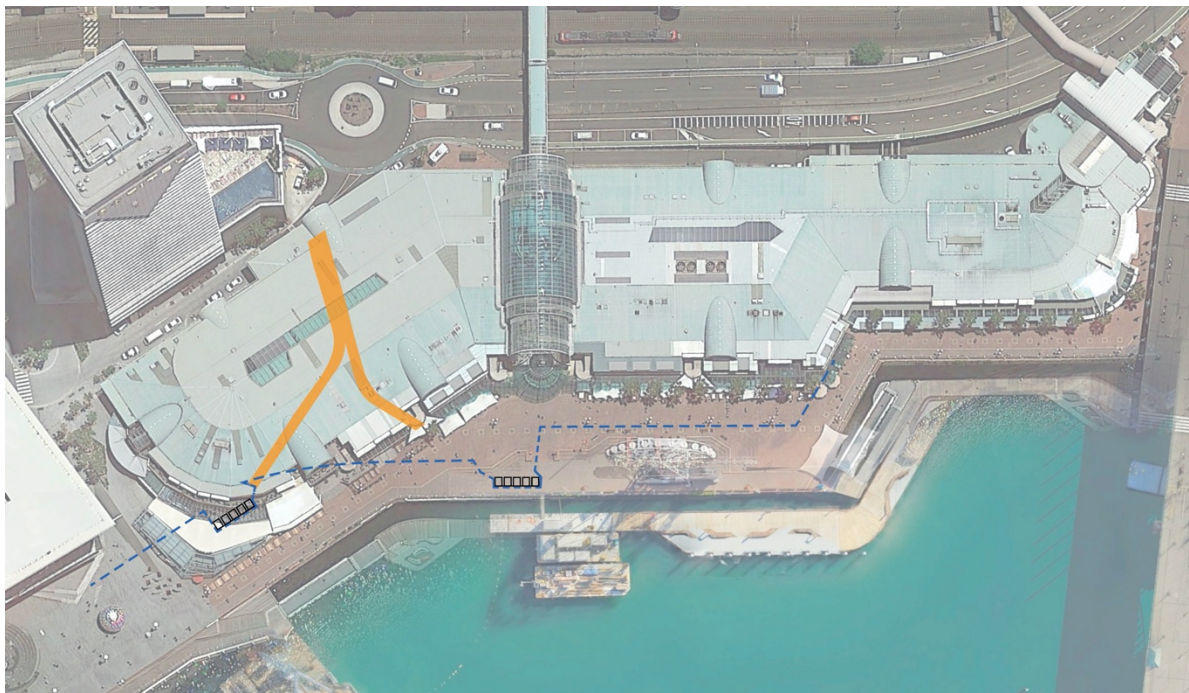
Overlay showing tunnel outlets location within the concrete seawall. The saltwater conduits in orange and the concrete seawall (the dashed blue line) are overlaid onto a Google Earth image while the new outlets have been added in black.⁸
